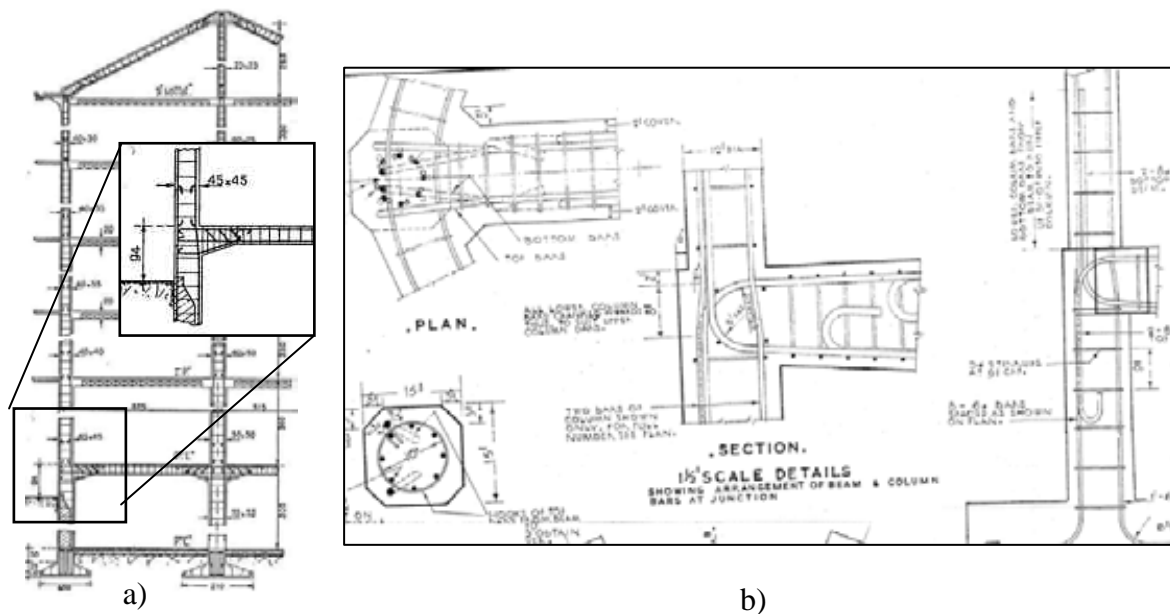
Pre-1970s RC construction practice: a) Typical Italian 1950s gravity-designed RC frame (taken from [209]); b) RC beam-to-column and column detailing in Christchurch, New Zealand circa 1960s (Uni. Of Canterbury archive).
